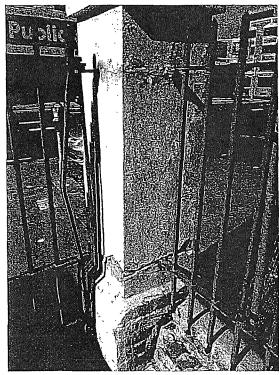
Pier near west tower, showing large cracks and displaced areas of brick (arrow) and corroded metal fence.
